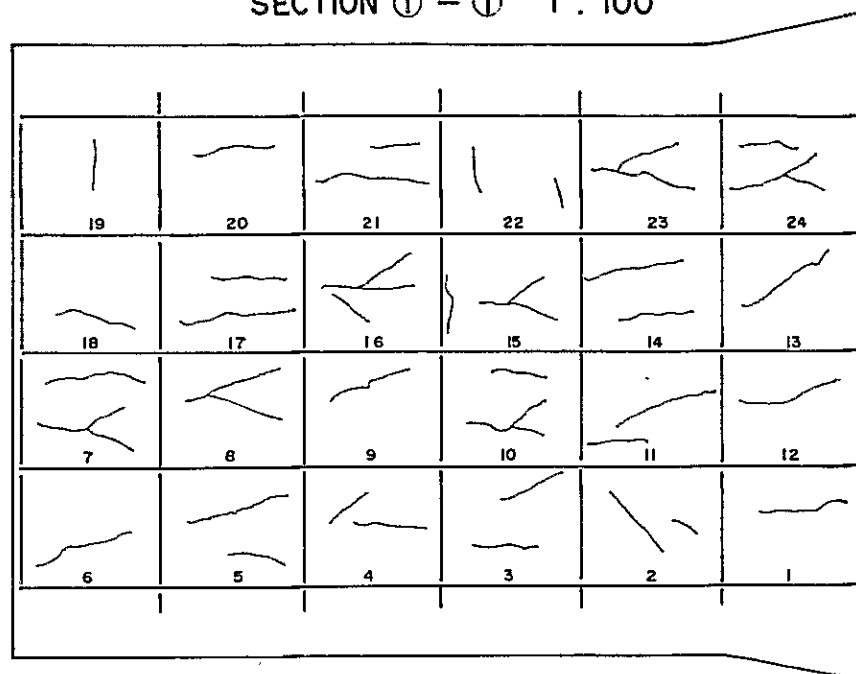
CRACKS DEVELOPED ON THE CONCRETE FLOOR SLABS OF THE MAIN AND APPROACH BRIDGE — KRUNG THEB BRIDGE
